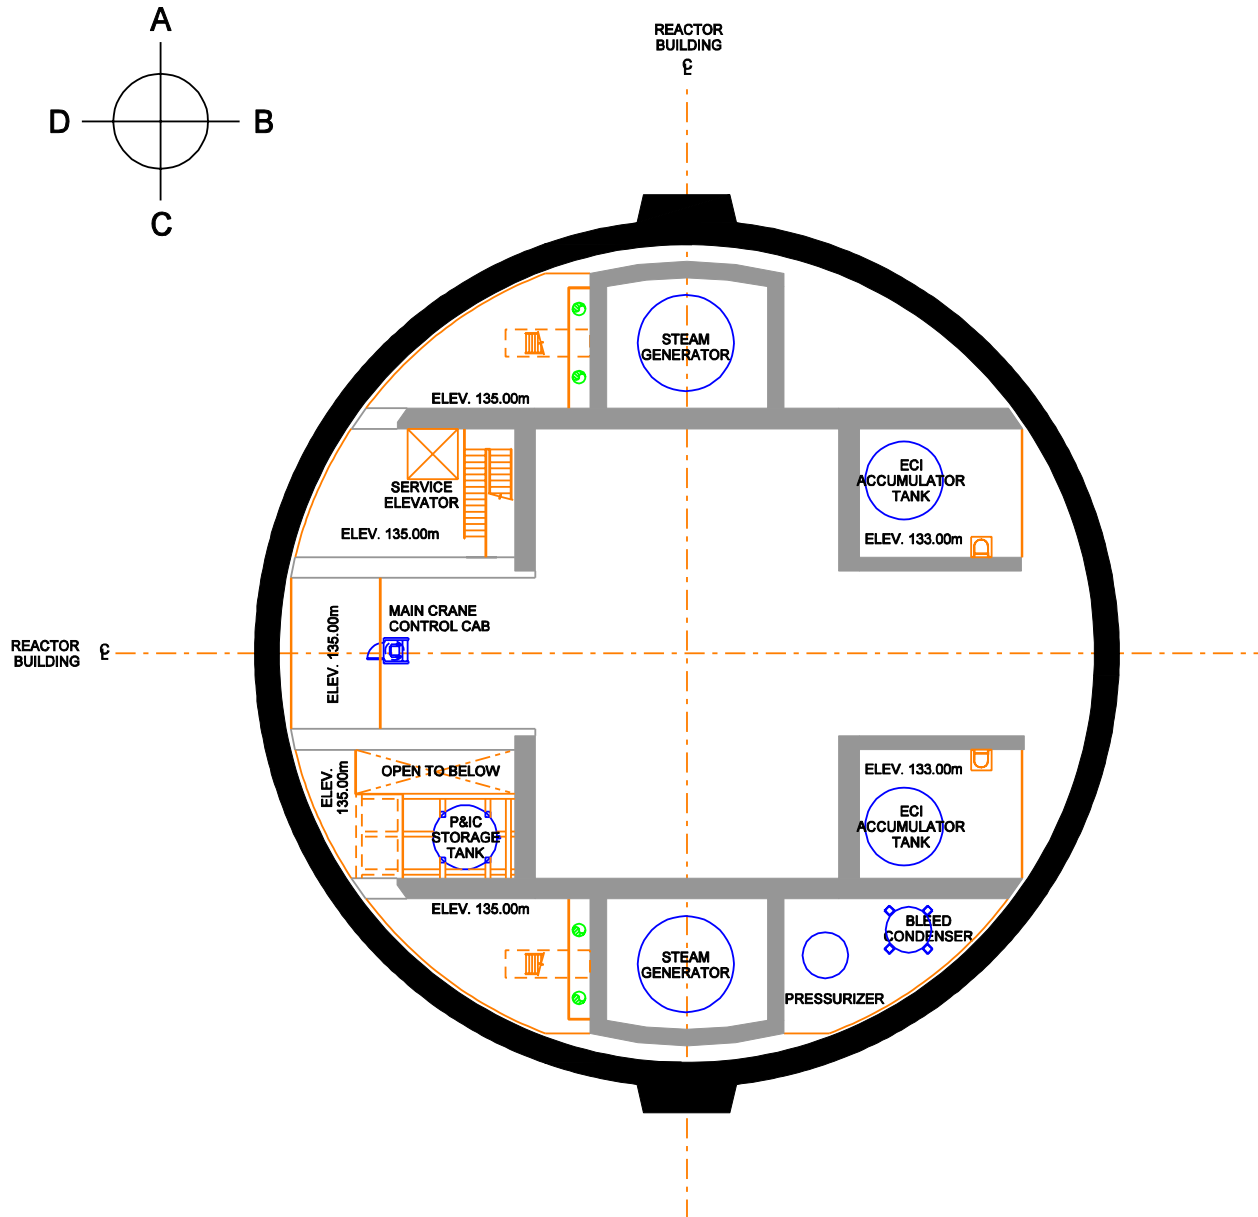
ACR-700 Reactor Building - Plan @ Elevation 135.0
